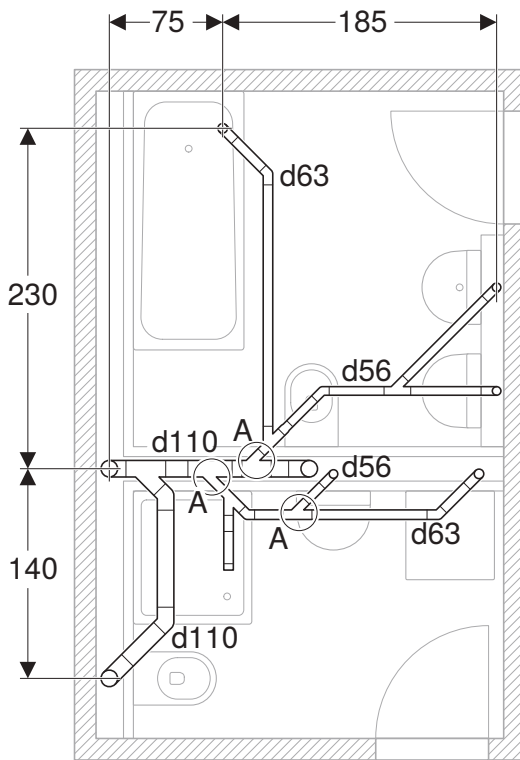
Design detail with reduced branch fittings 45° and pipe embedded in concrete ≤ 4 metres
